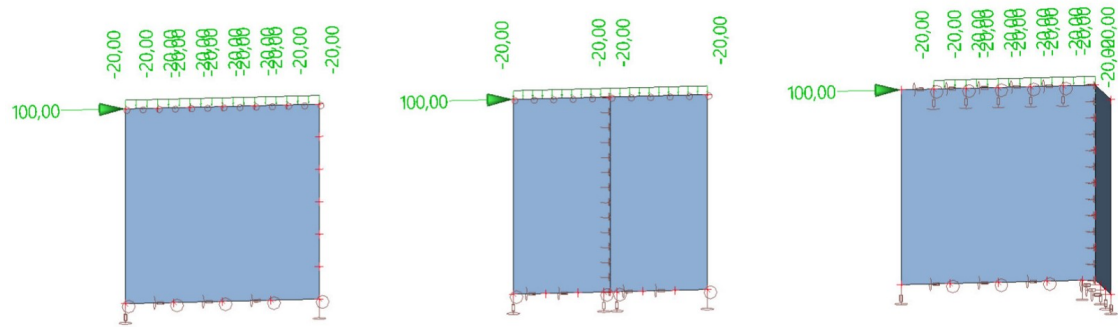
Numerical models of the CLT shear walls with: (a) basic shear wall, (b) coupled shear walls and (c) shear wall connected to perpendicular wall and floor
